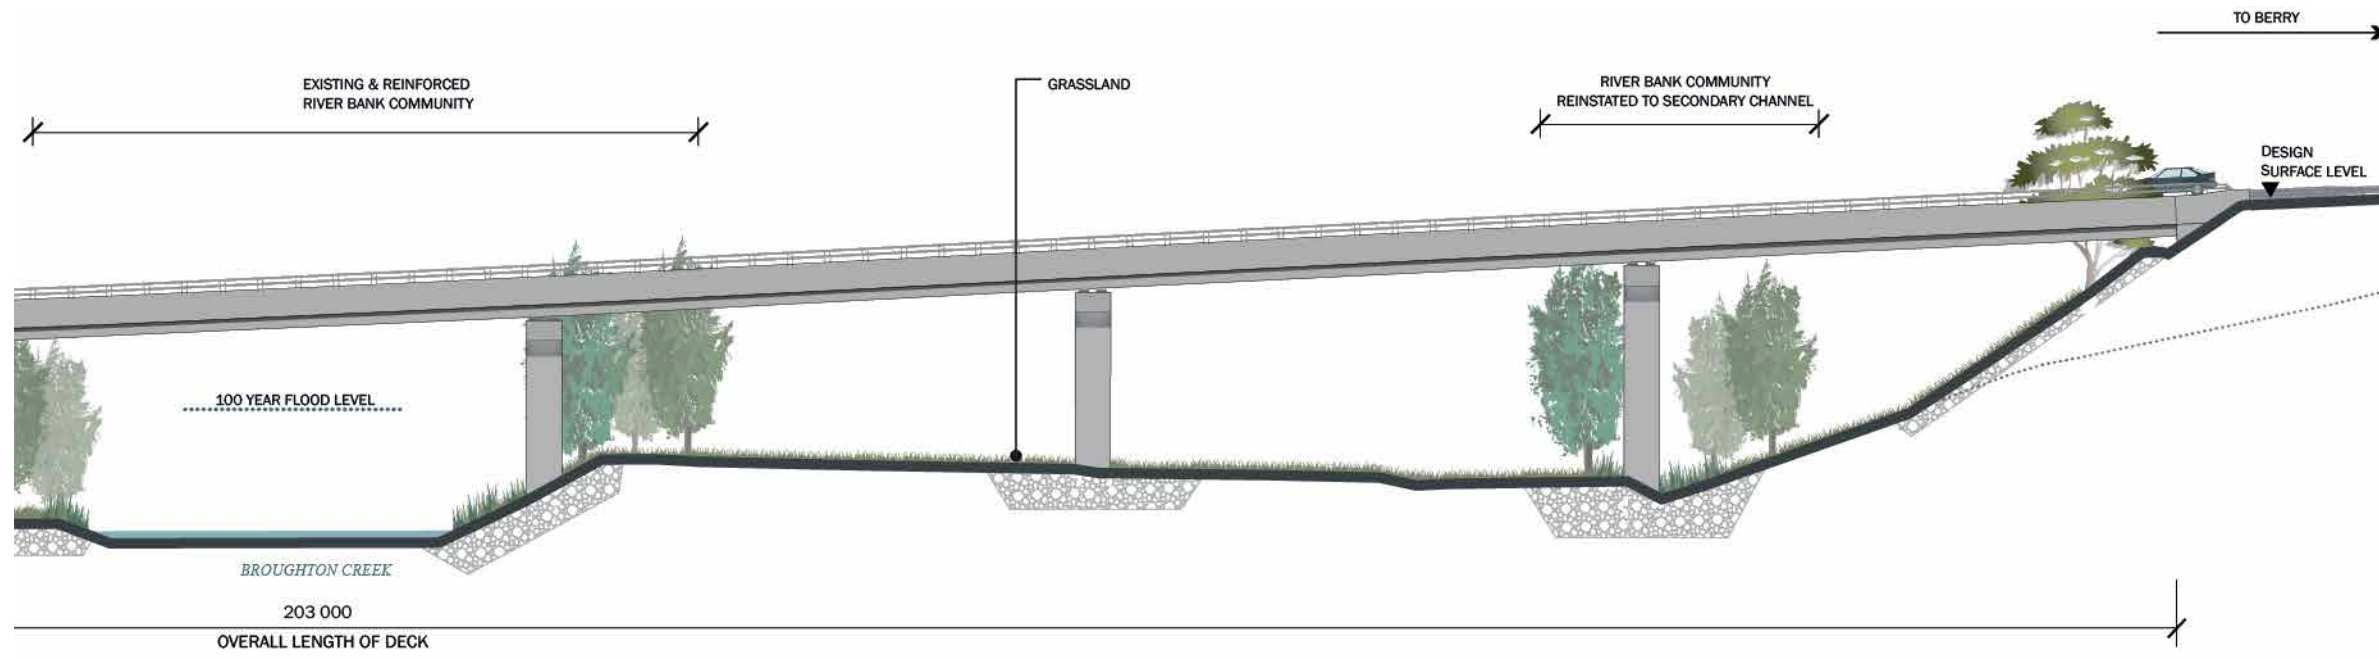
Section – Bridge SB04: Broughton Creek Bridge No. 3
